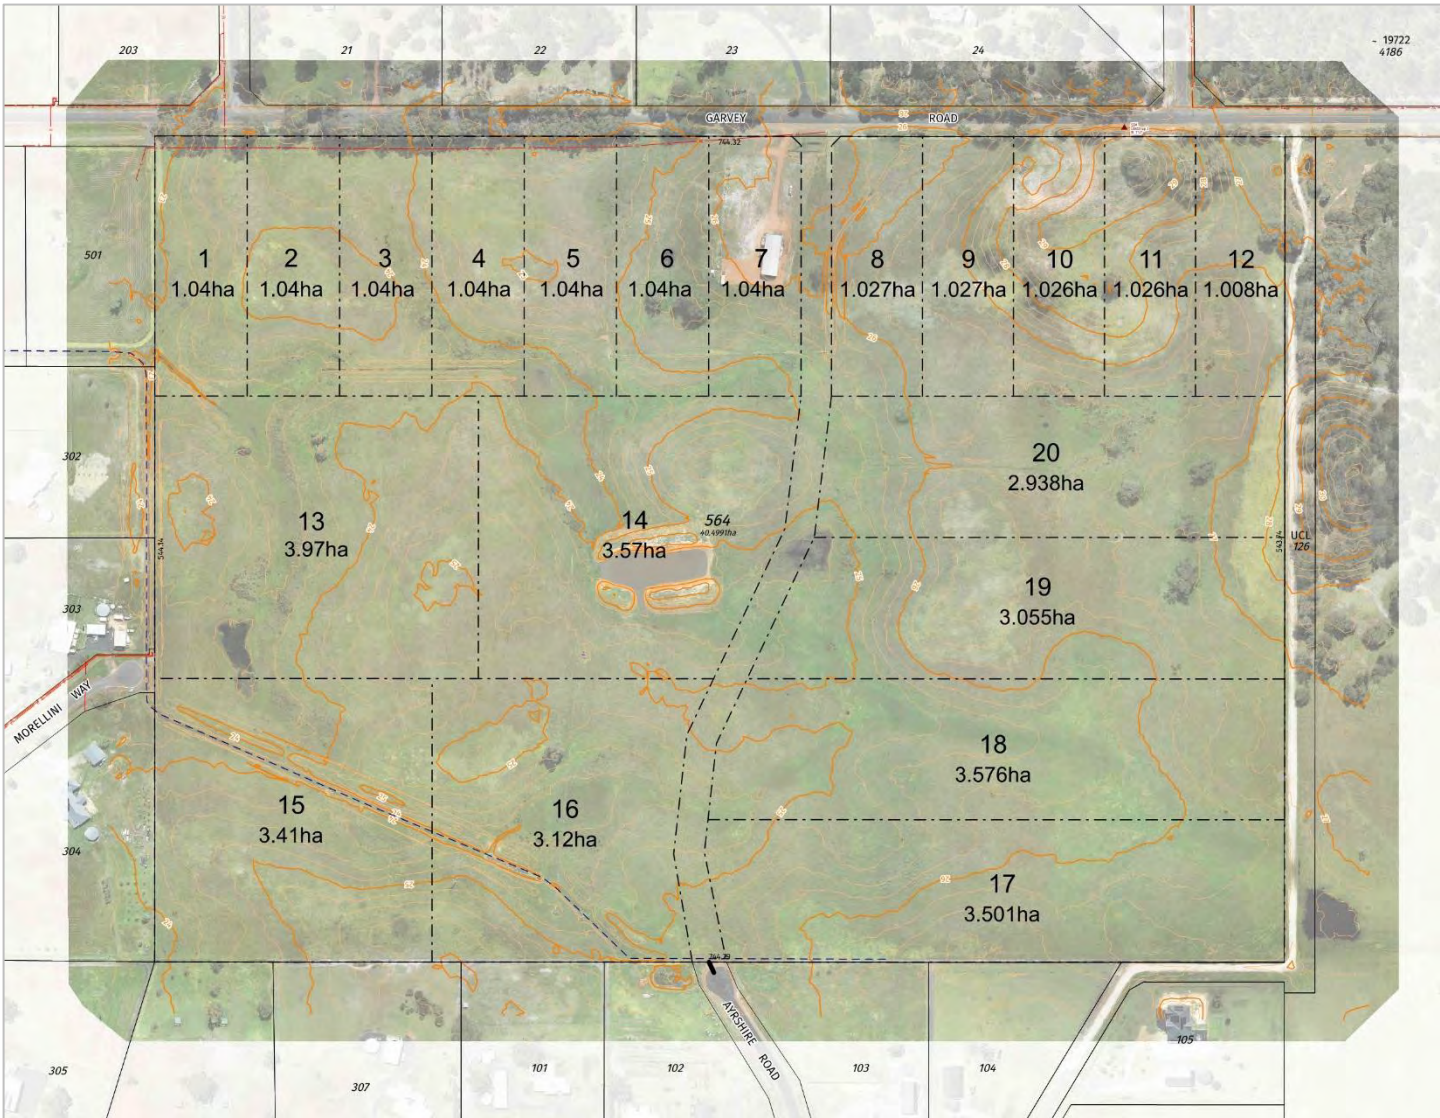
Lot 564 Garvey Road site Concept Plan (source: Harley Dykstra, June 2024)
